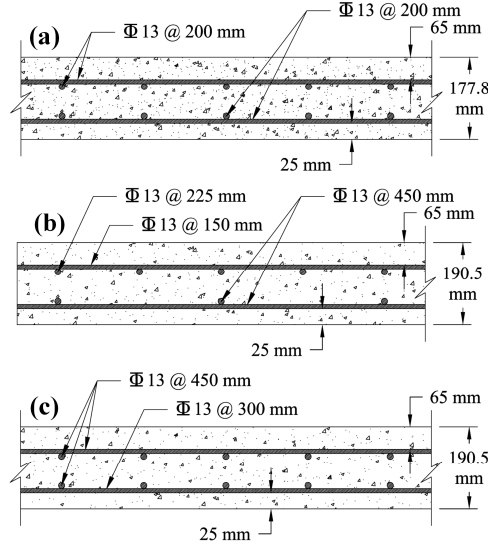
Deck reinforcement details: (a) Tennessee bridge, (b, c) Nebraska bridge (cantilever, non-cantilever)
